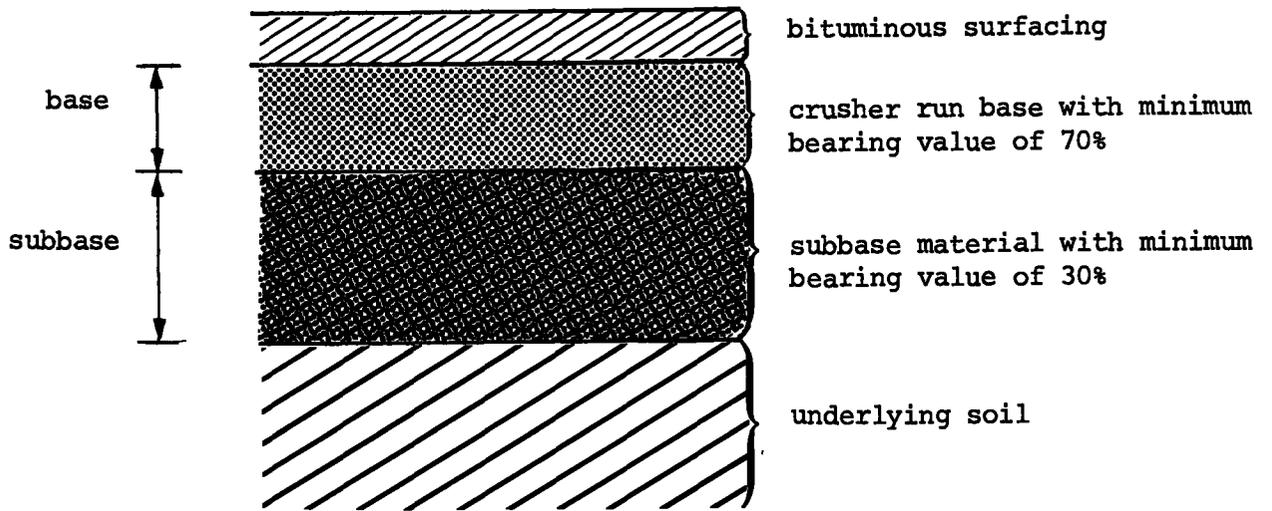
CROSS SECTION DESIGN OF ROADWAY
